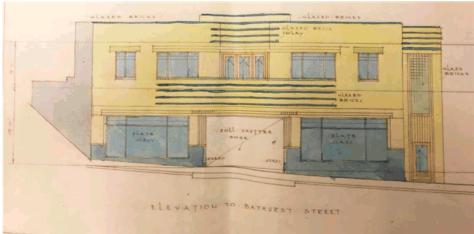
1937 plan showing Bathurst Street elevation of the garage (TAHO, AE417/1/2108, 125 Bathurst Street (6871).
